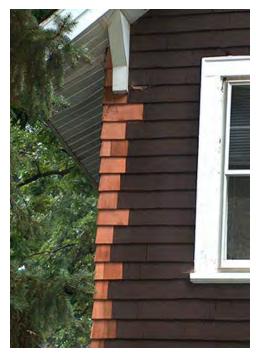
One of the advantages of wood shingles as a wall covering is that individual shingles that are damaged can easily be replaced. On this highly exposed corner. worn shingles have been selectively replaced to help safeguard against water damage. The new shingles will be stained to match the existing shingles
